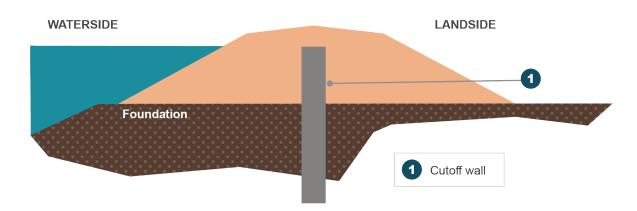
Typical Seepage Cutoff Wall—New Embankment
